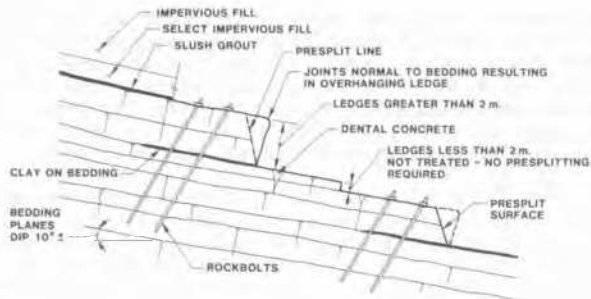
UPPER DAM LEFT ABUTMENT CORE FOUNDATION TREATMENT
